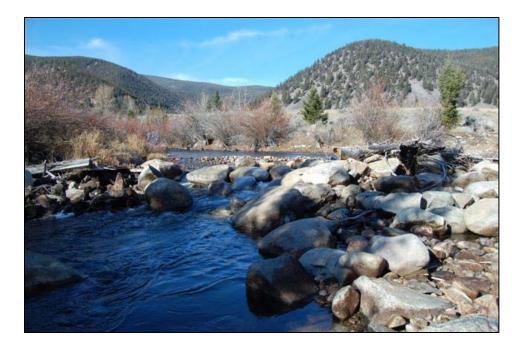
Looking upstream at steep grade control structure at Company Ditch.
